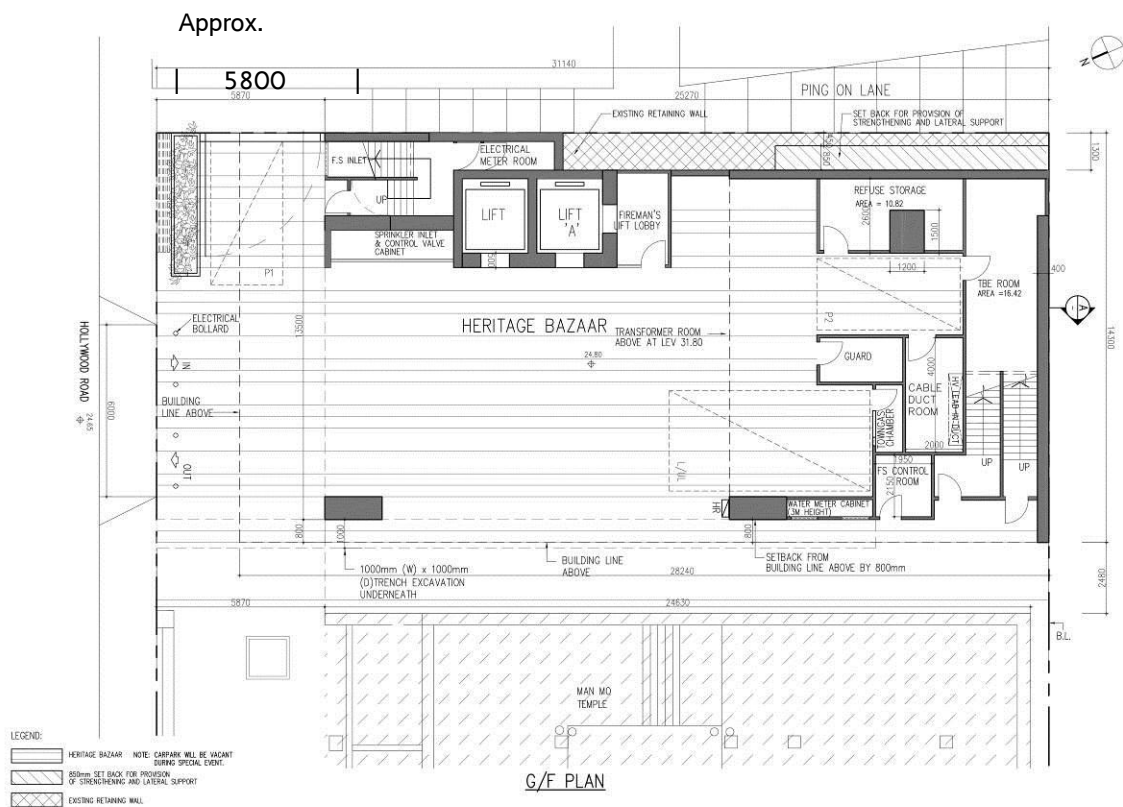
Ground floor plan under Option 2, with stair core setback from Hollywood Road by approximately 5 800 mm.
